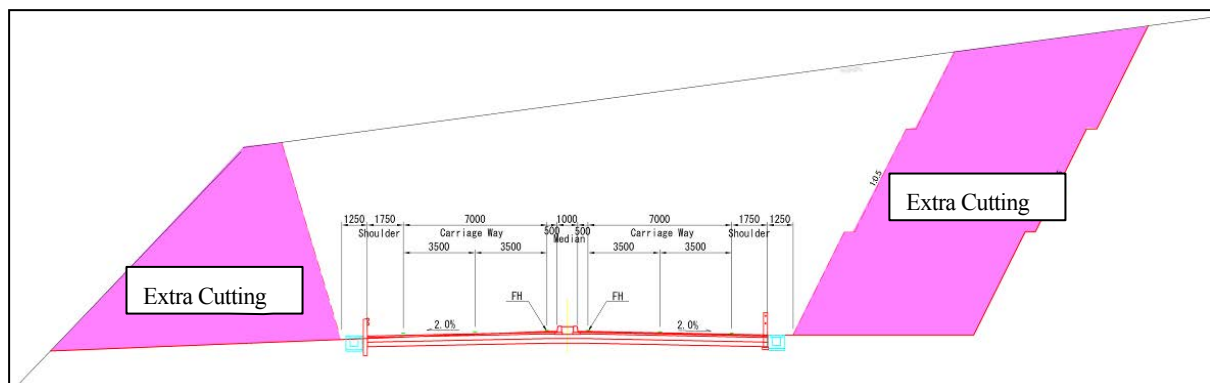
Cross Section at Proposed Borrow Pit
